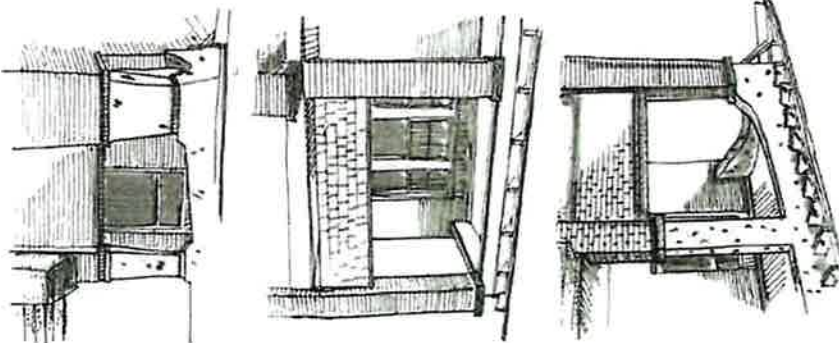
Burghlove House with a wide overhang and a wide overhang.
